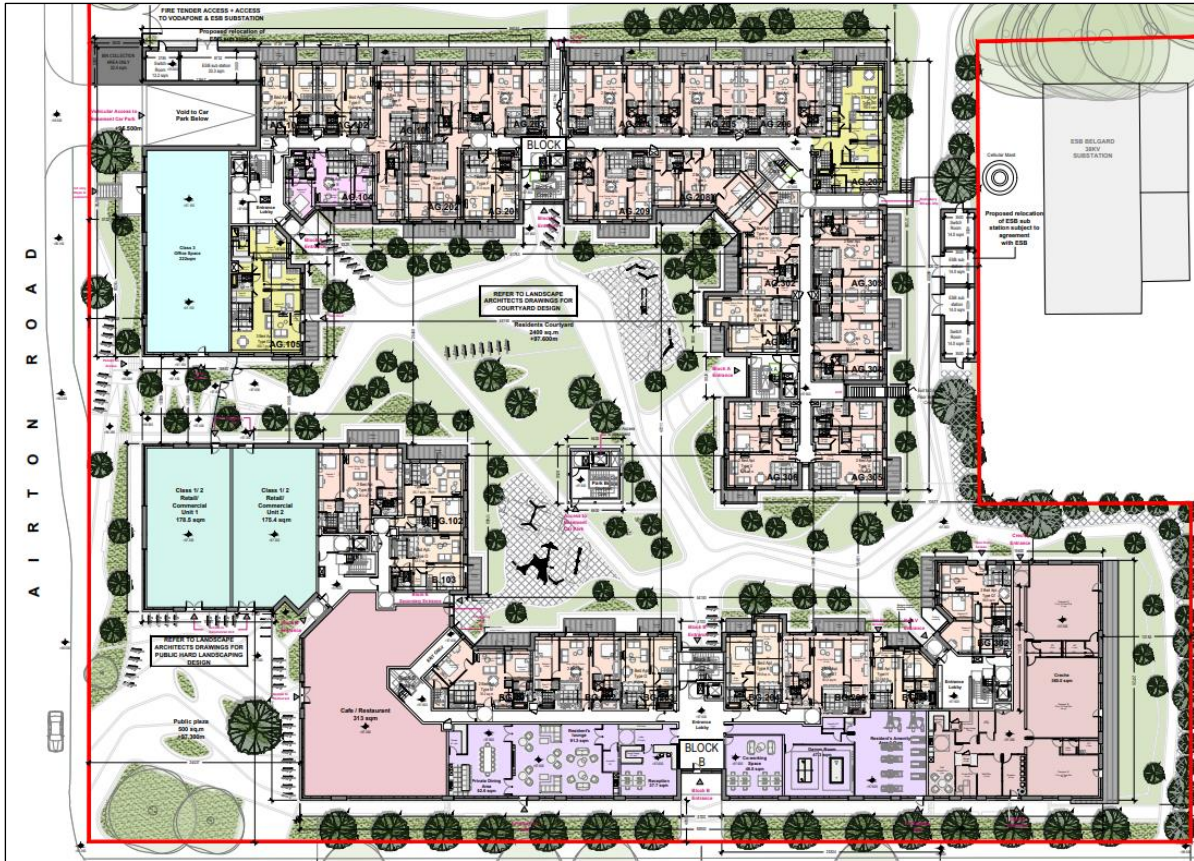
Ground floor layout plan approved under ABP Ref. ABP-305763-19
